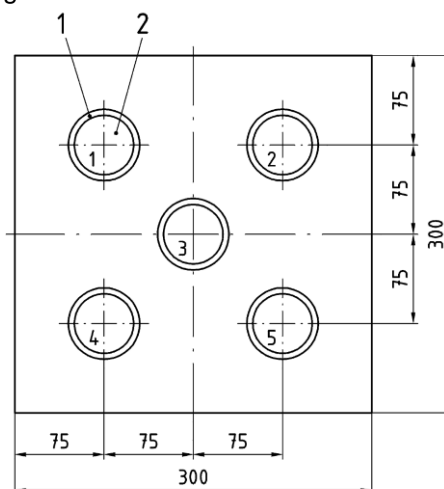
Top view on the test specimen after drilling the concrete cylinders out of the concrete plate according to EN 1542
